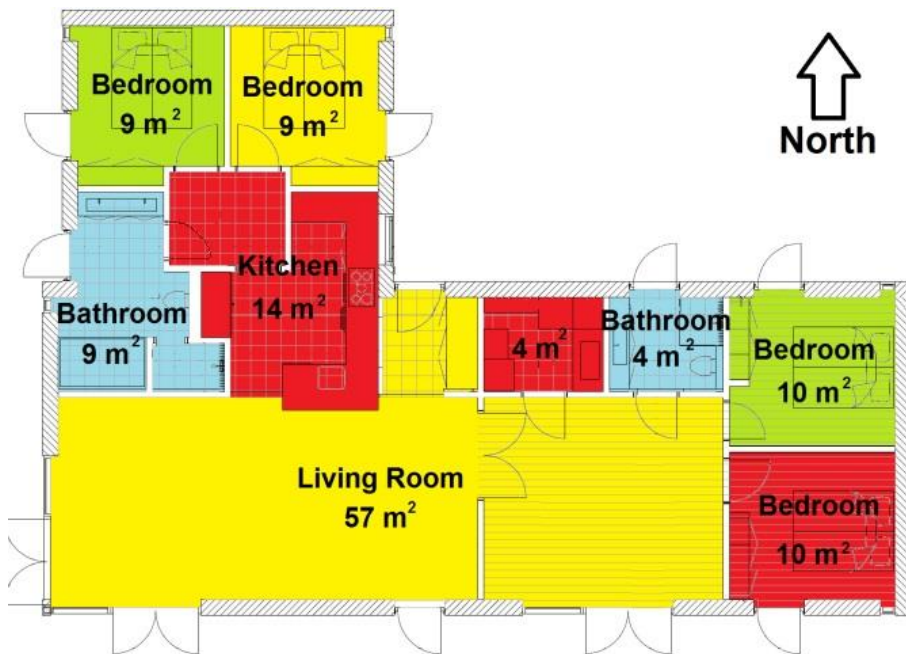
Plan view of the house case study: a typical single family house in Denmark
